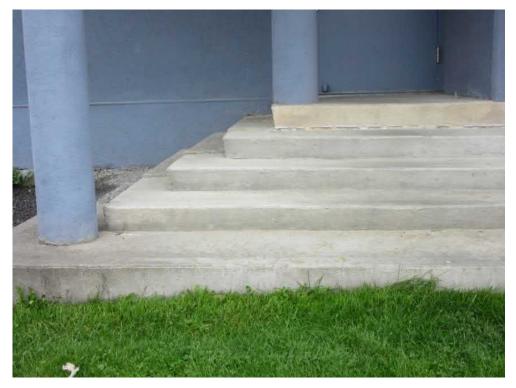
Settlement at Long Term Care Wing Exterior Stair
